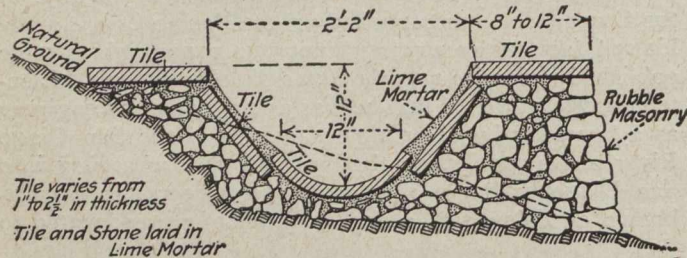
Typical Cross-section of Old Mission Conduit Near San Diego, California.
